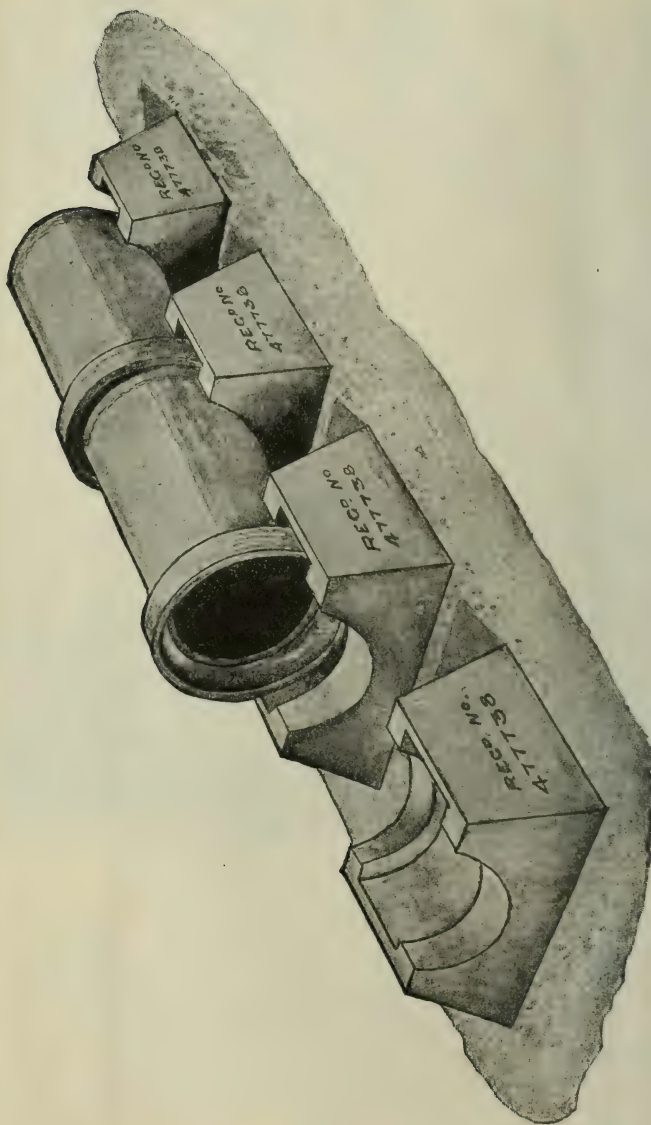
Foundation Blocks for Sewer Pipes : Dean Stone Company.
